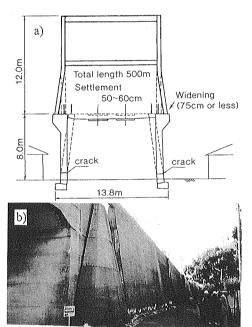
Typical damage to leaning-type unreinforced concrete RWs; embankment along Kobe Line of Hankyu Railway Co. between Okamoto and Mikage Stations (Site LT2 in Fig. 2); a) sketch and b) picture
